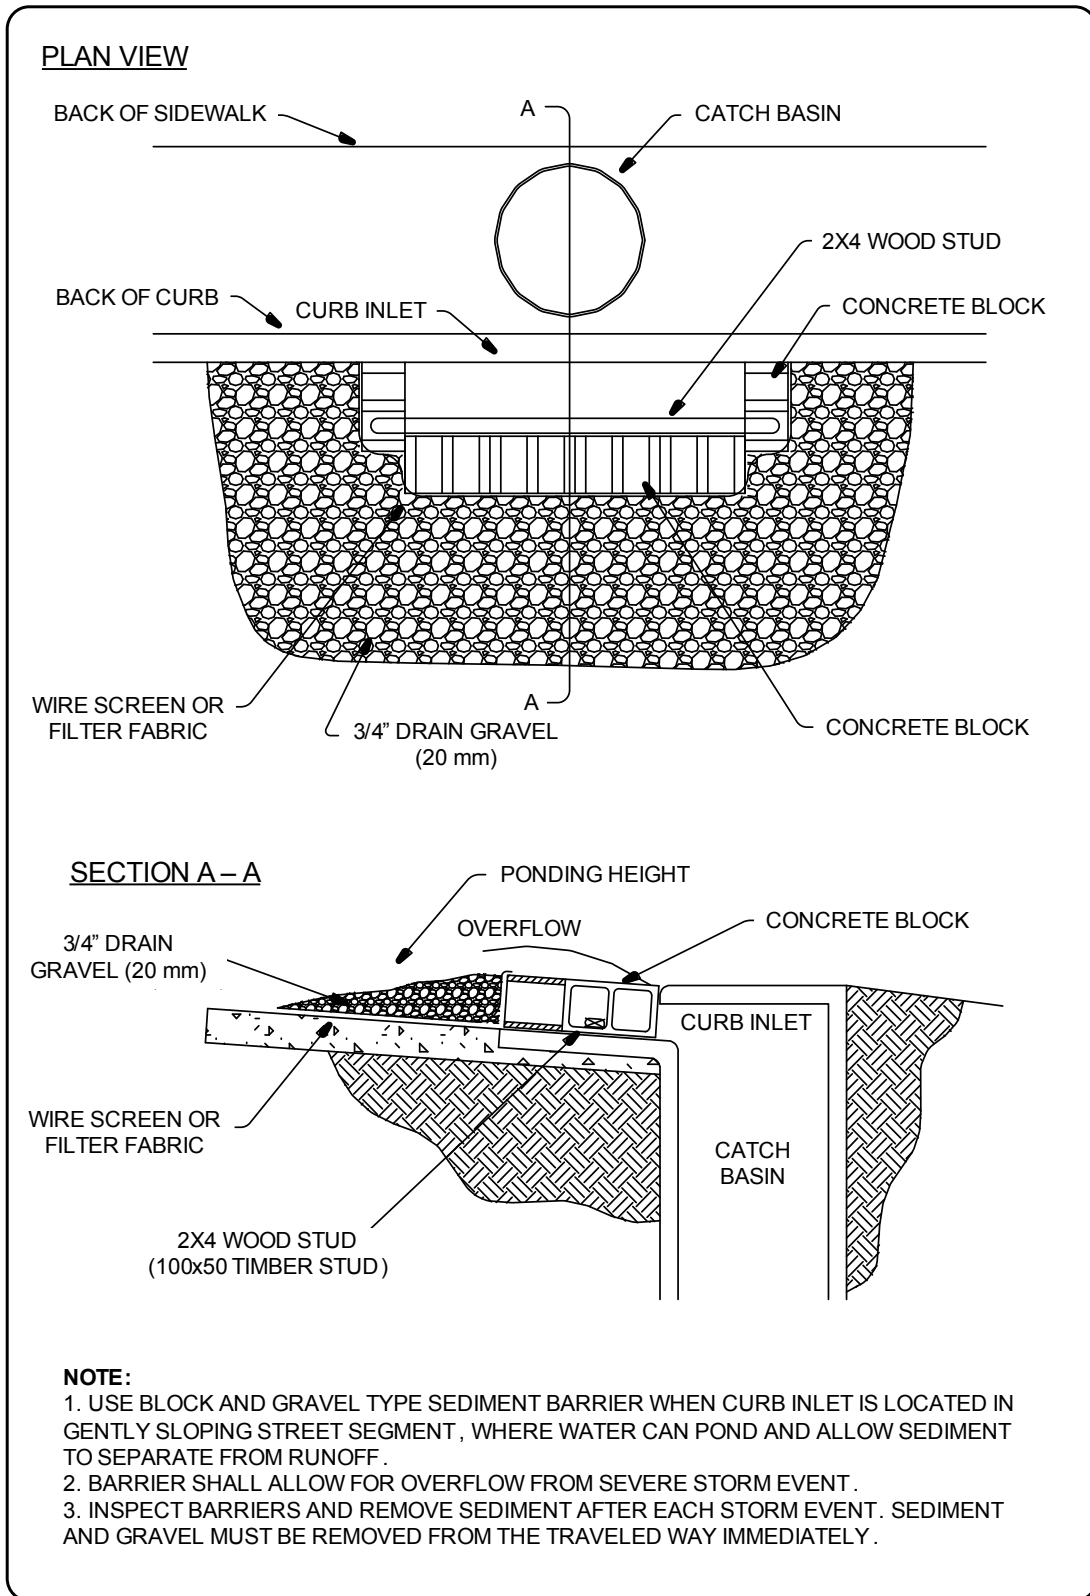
21. Block and Gravel Curb Inlet Protection
